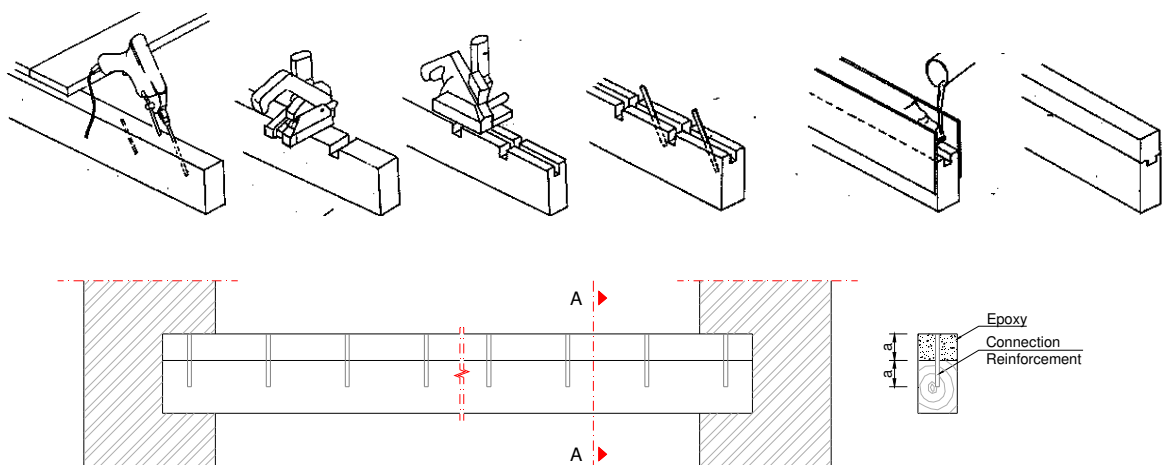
Strengthening of sections with epoxy resin and connection reinforcement.
